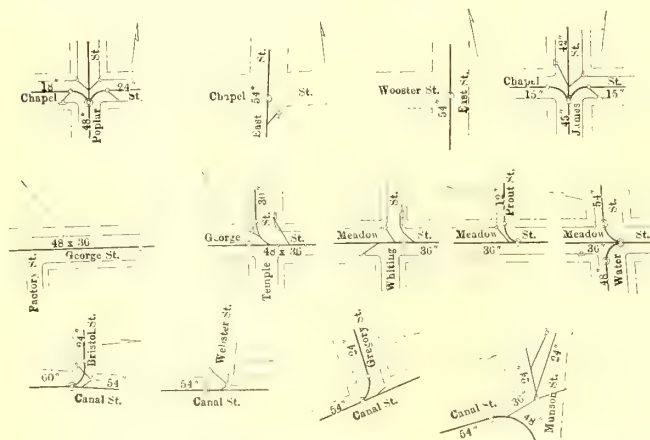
SECTION OF CHART SHOWING SEWER MANHOLES
